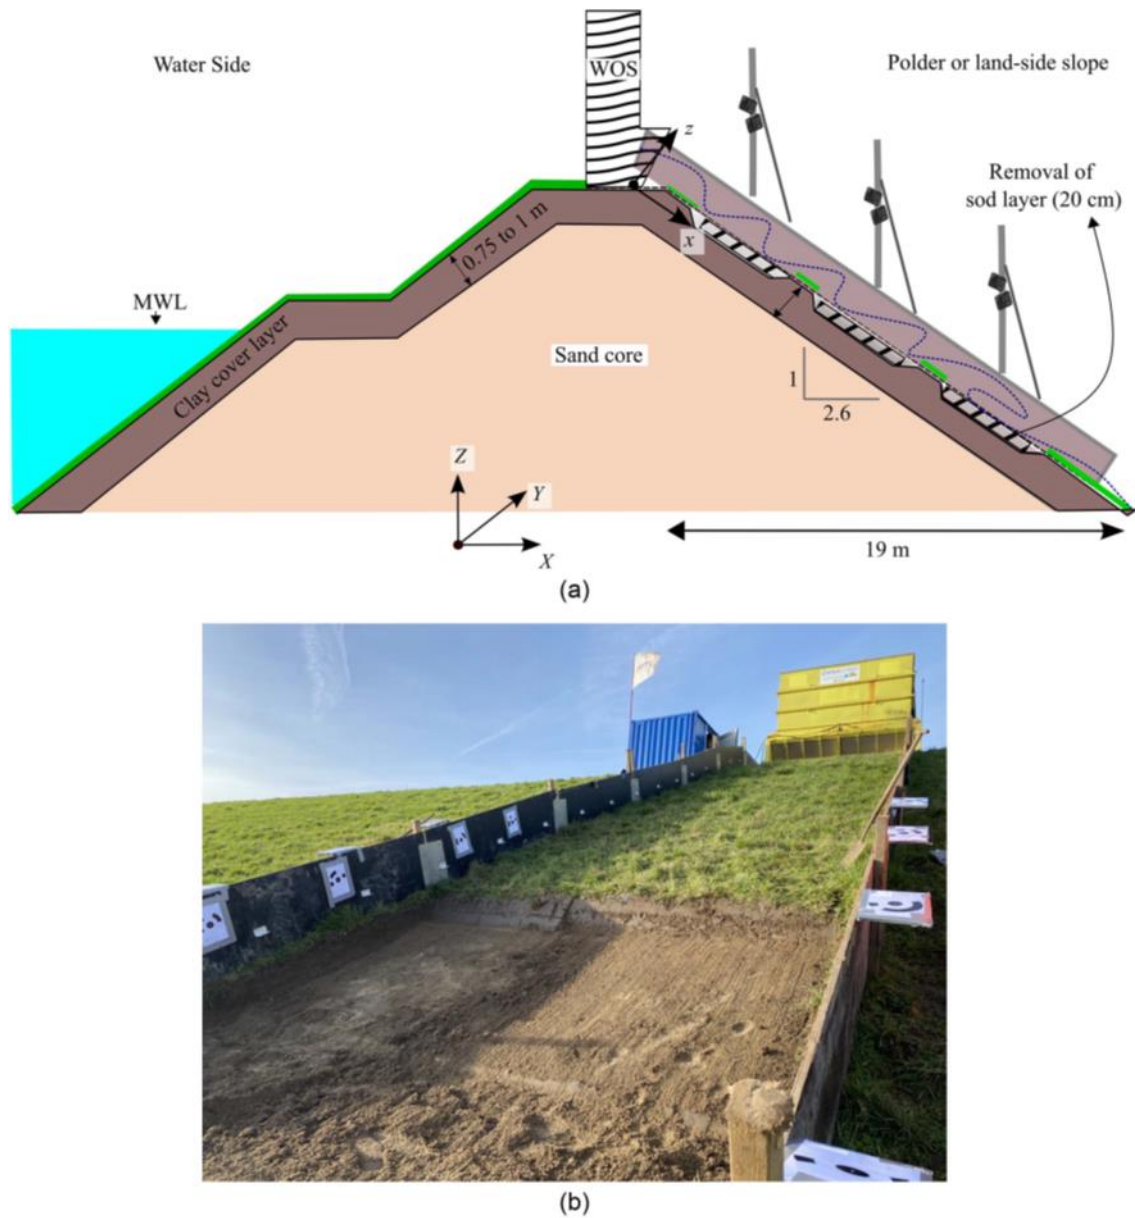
(a) schematic view of typical Dutch levee cross-section as well as BC test layout, and (b) example of prepared testing section for BC experiments.
